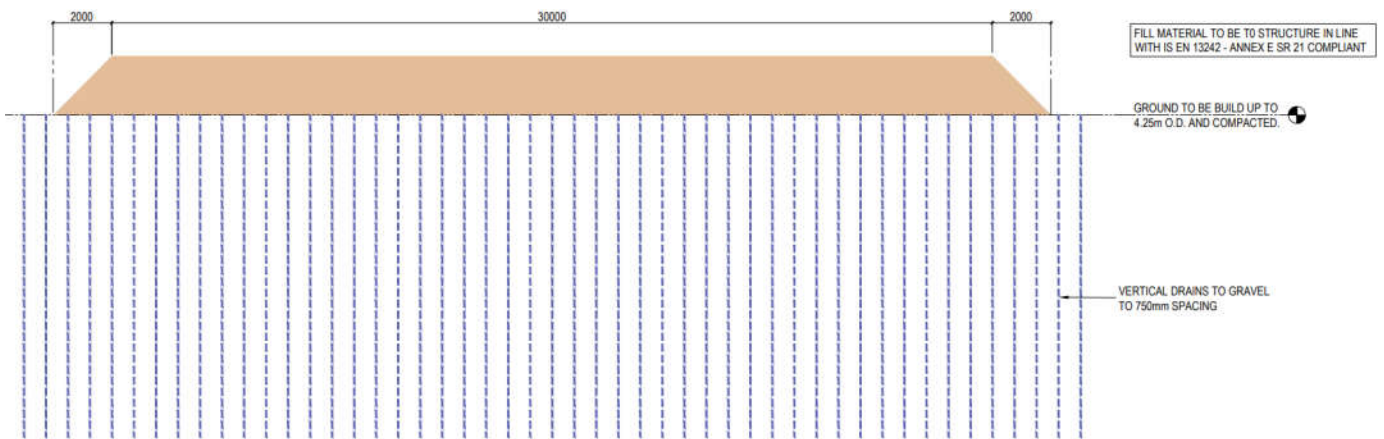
Schematic Configuration of Proposed Ground Improvement Works (Test Phase)
